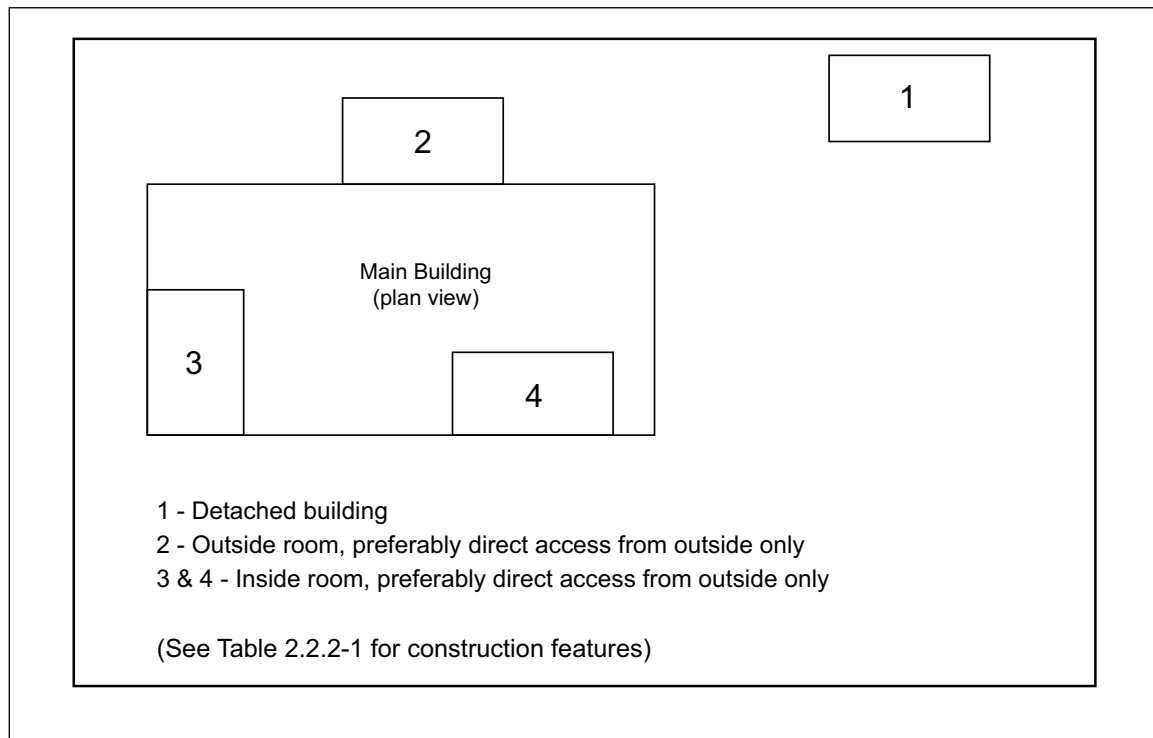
Locations for oil-filled capacitor buildings and rooms
